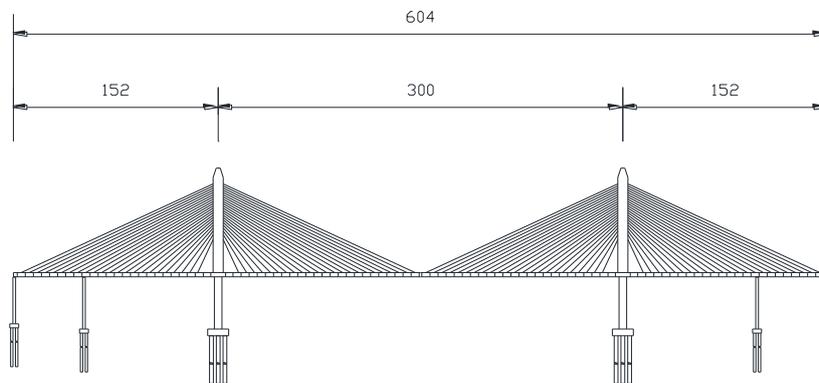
The elevation of Fanhe bridge (unit: m)
